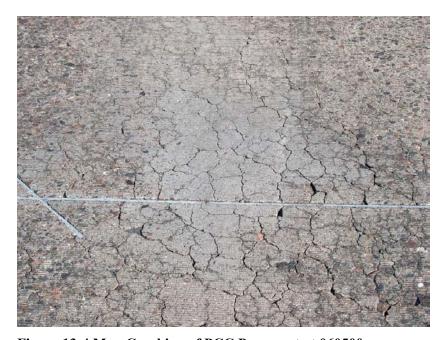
Map Cracking of PCC Pavement at 060500
